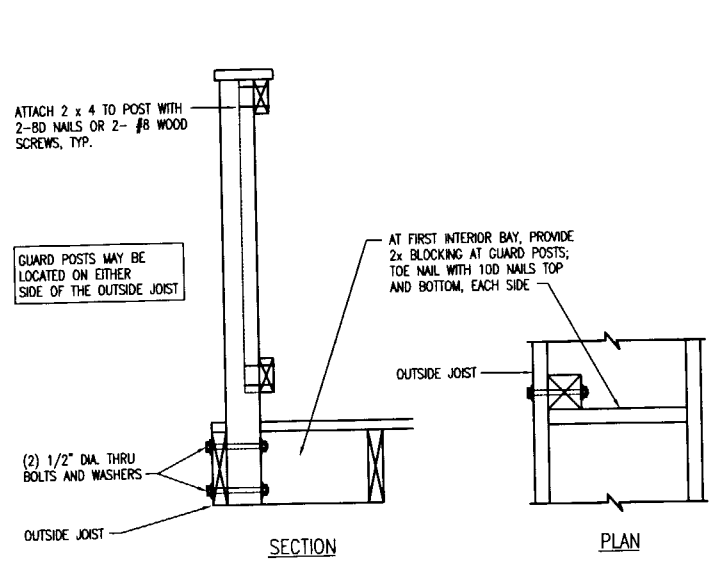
GUARD POST TO OUTSIDE JOIST DETAIL
